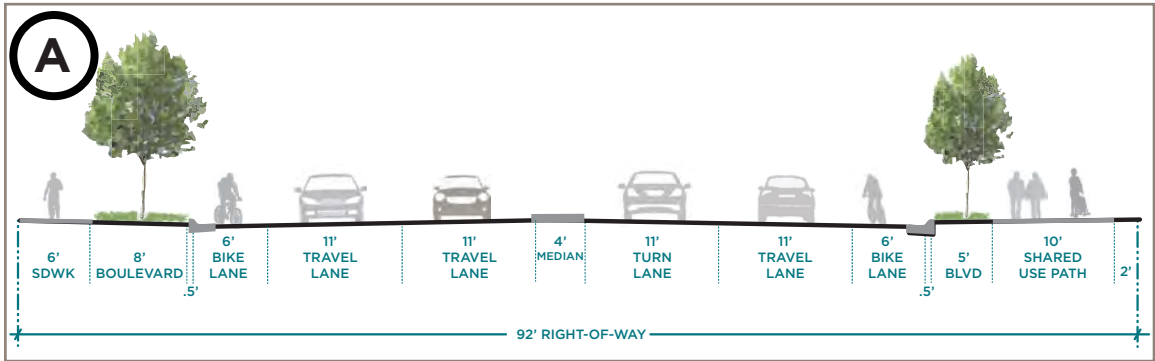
Preferred Alternative East Broadway Segment 'A' Typical Section Looking East
